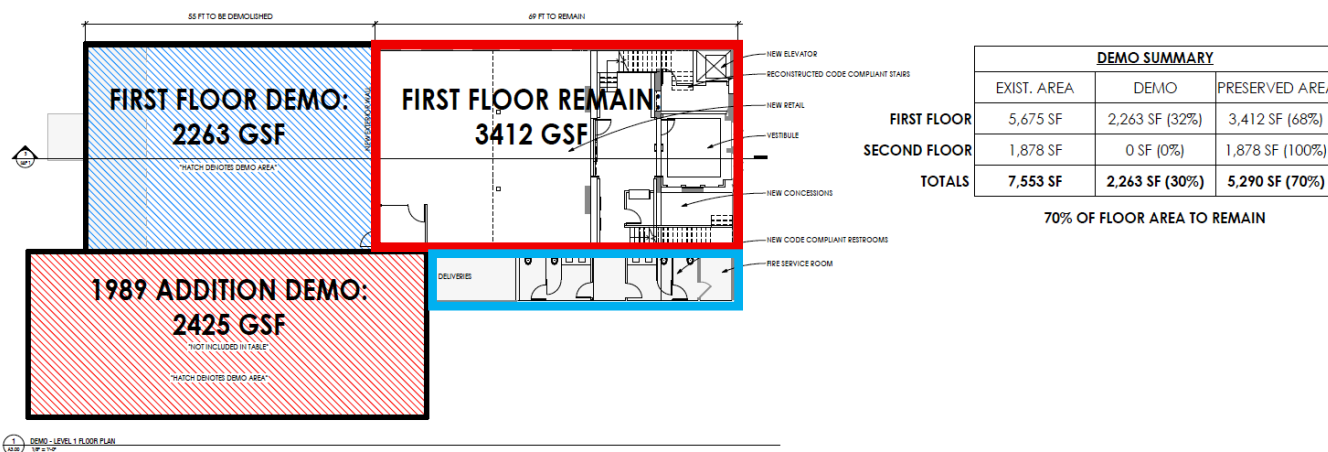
Proposed NEW floor plan overlayed with demolition plan. Proposes new stairs, bathrooms, adding an elevator. Applicant did not provide EXTANT plans of theater. Original theater outlined in red. 1970s corridor outlined in blue.
